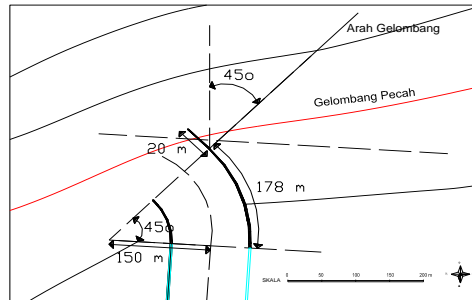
ADDING OF 20 M ON BREAKING WAVE
